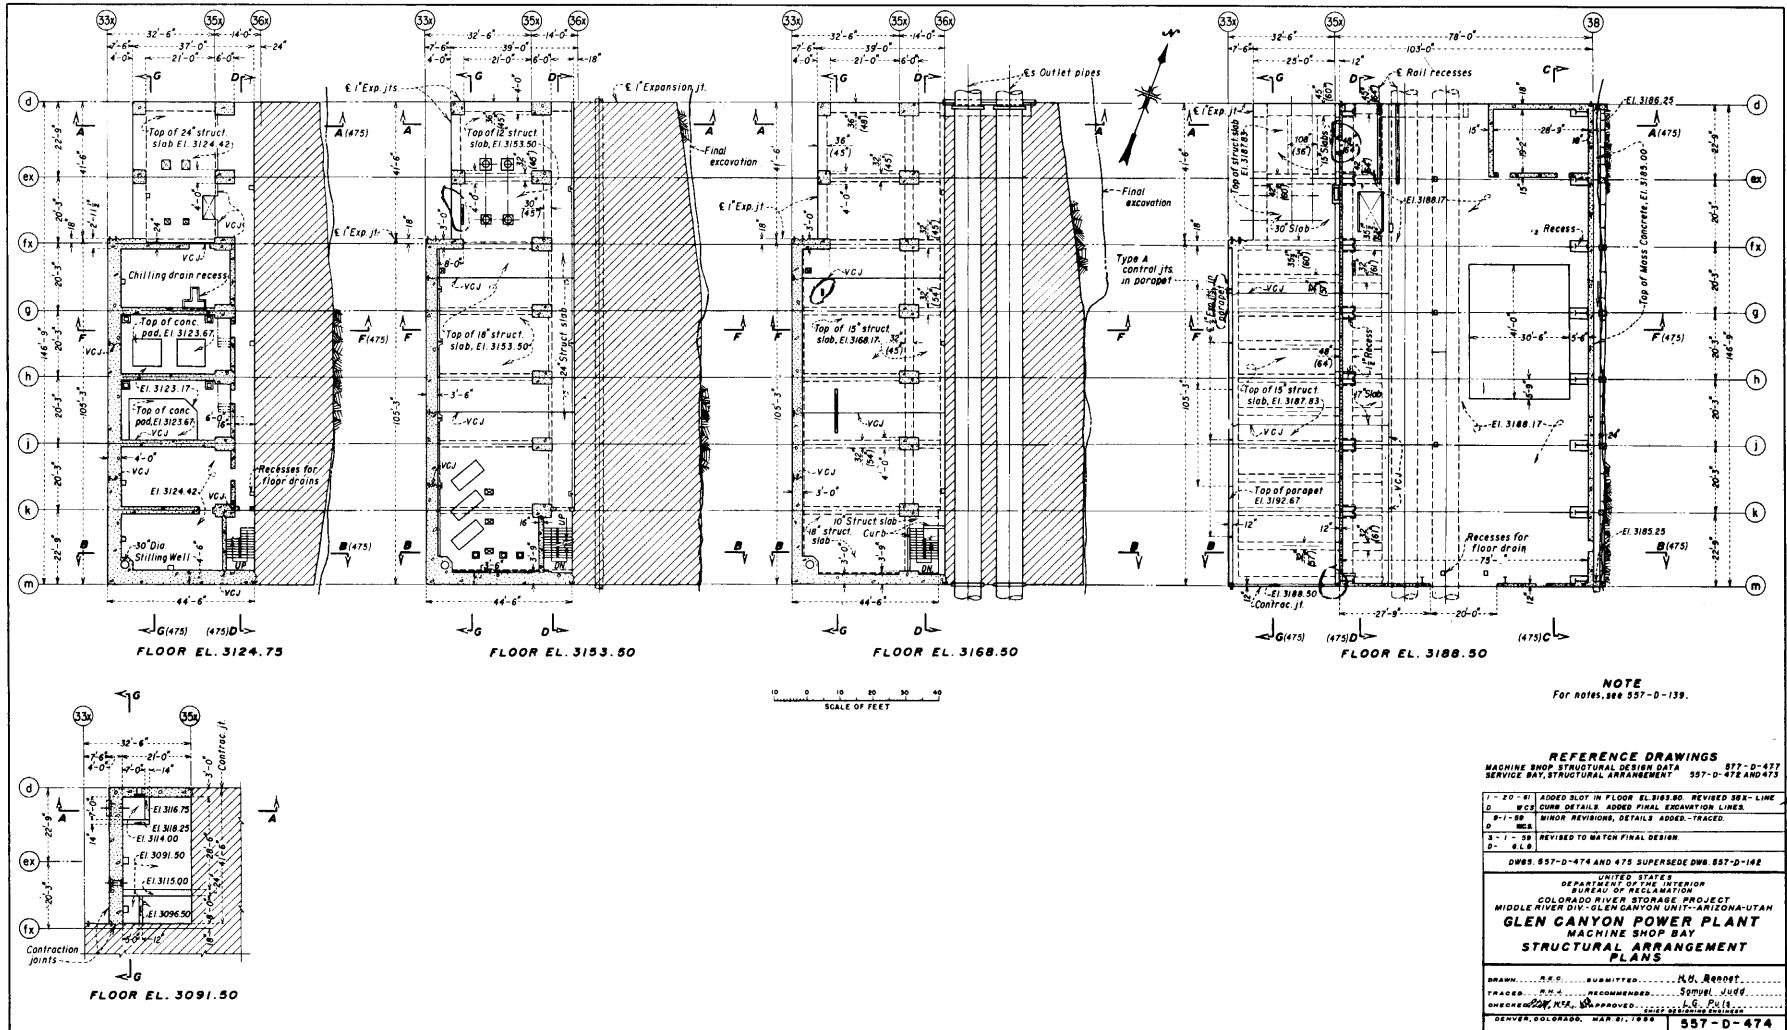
Powerplant structural arrangement plans—Machine shop bay.
